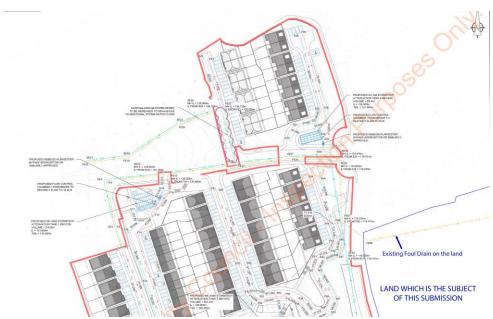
Extract from Drainage Layout Planning File Ref: 22/504.
